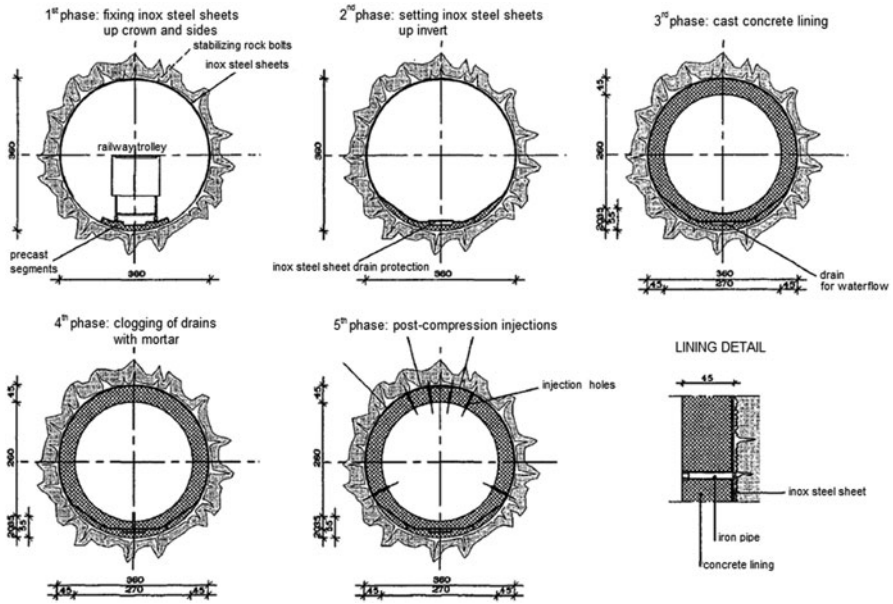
Steel sheets, injection and waterproofing for an hydraulic pressurised tunnel
